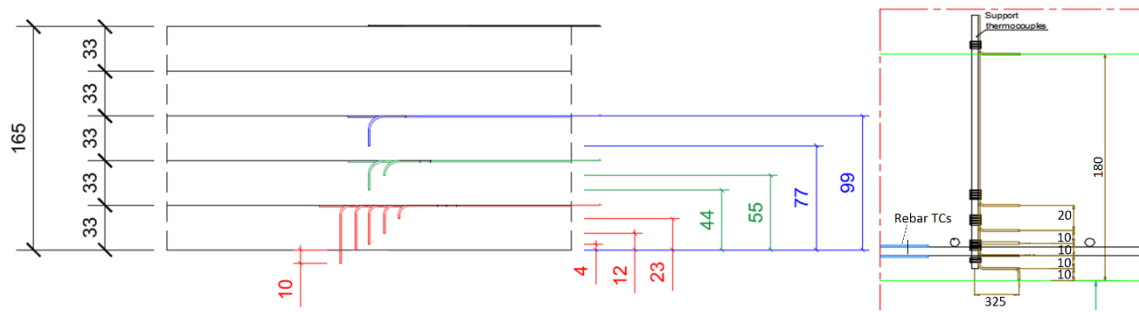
Thermocouple layout for CLT panels (left) and concrete slabs (right). All dimensions in mm.
